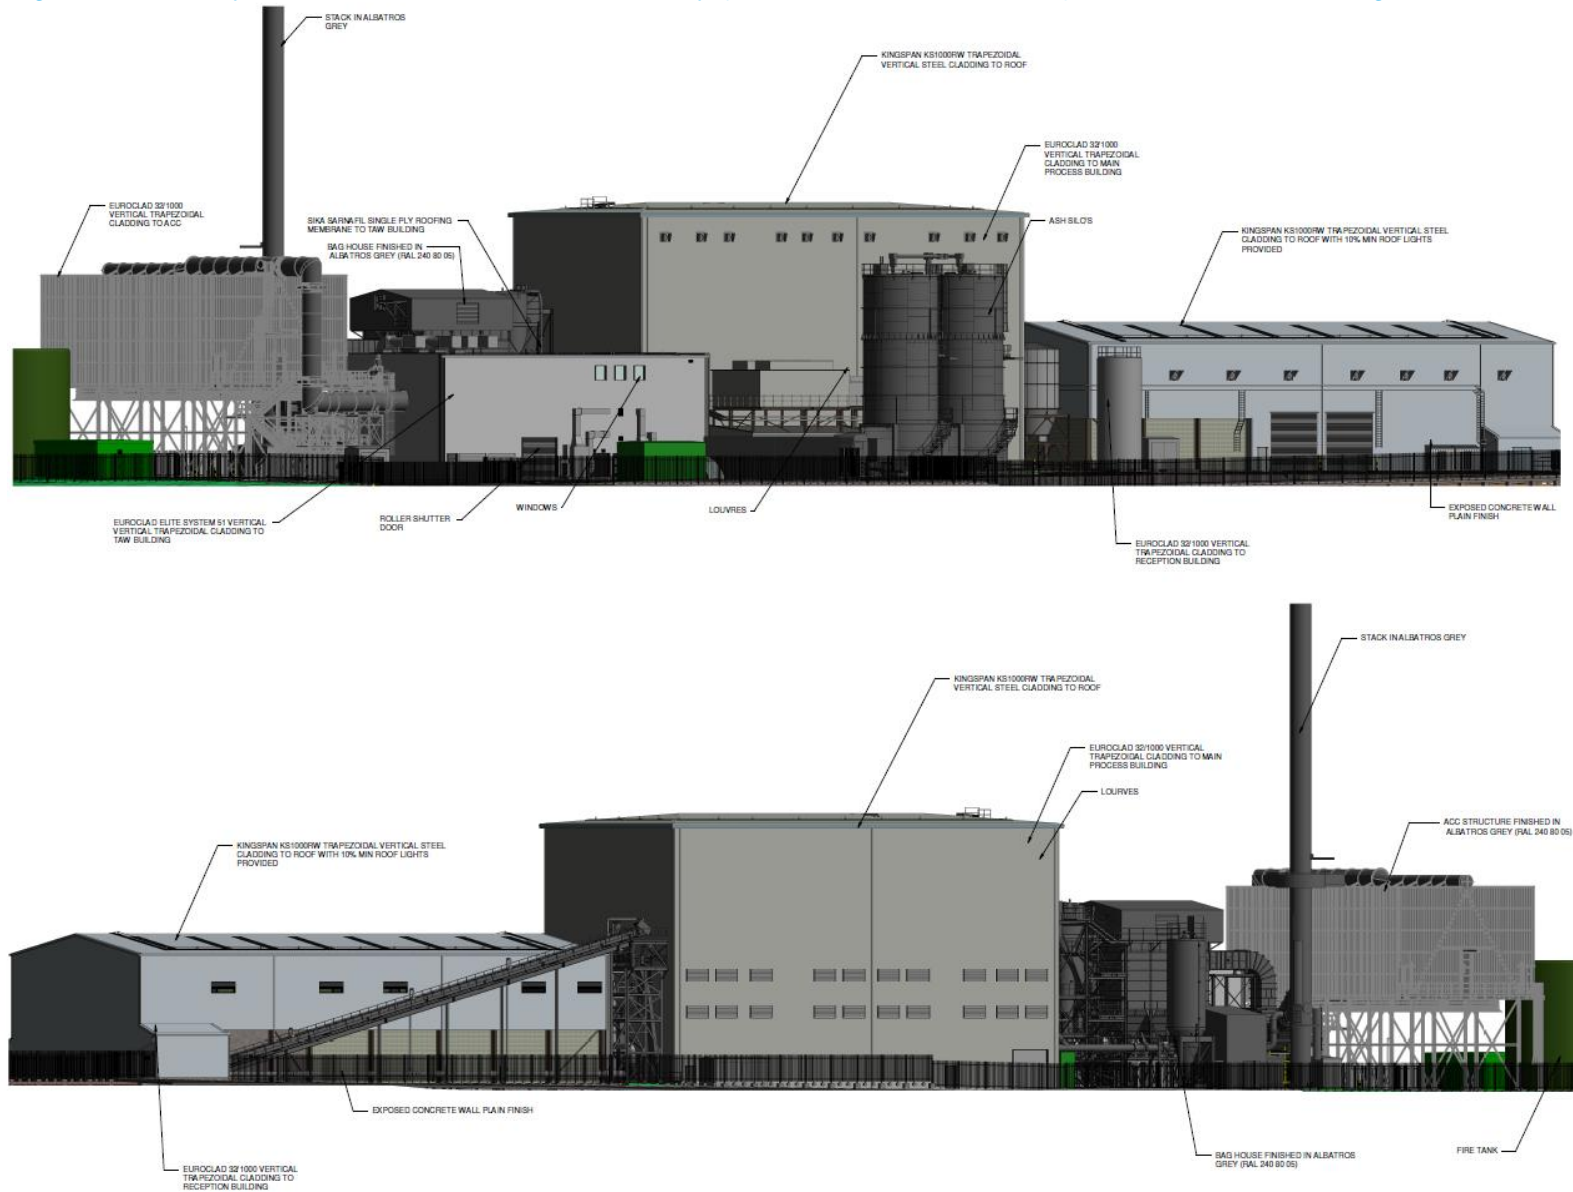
Surveyed Elevations of the As Built Facility (East and West Elevations) based on GHD drawings, March 2022
